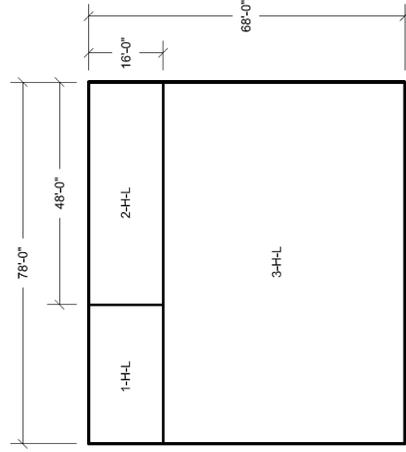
H16.55: PUMP HOUSE NORTH WALL LOOKING SOUTH
